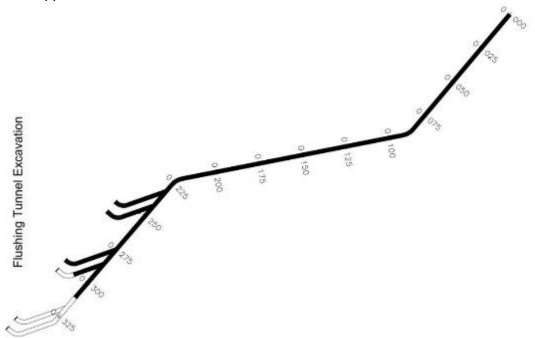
Schematic diagram of excavation of flushing tunnel
